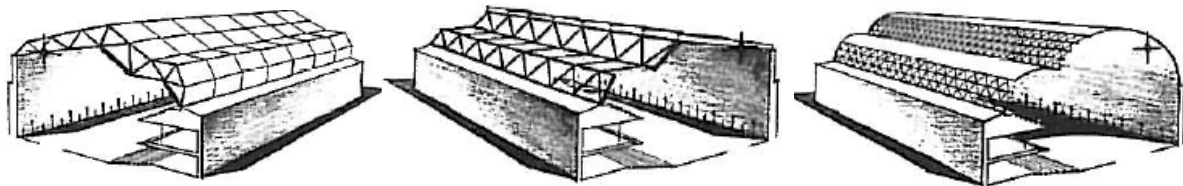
Transverse trussed girders, longitudinal girders as well as two intersected lobes.
